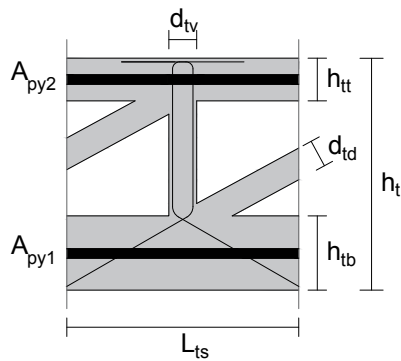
Detailed view of the open truss girder with indicated prestress and suspension reinforcement
